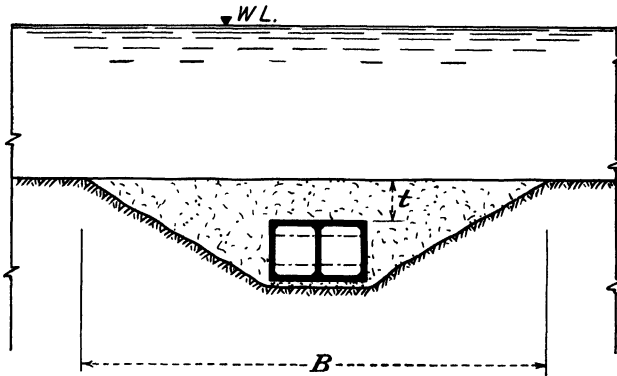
Cross section of subaqueous tunnel, showing principle of the trench method of construction.
